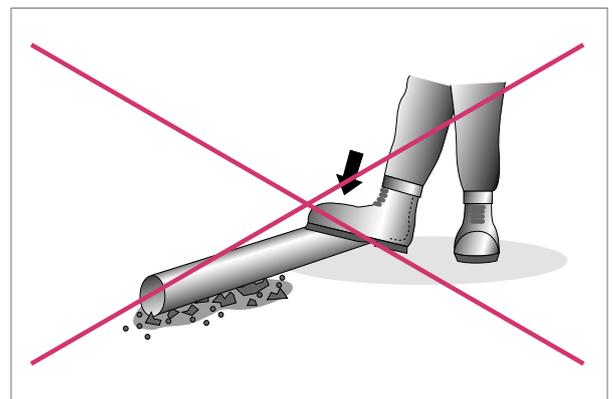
Do not store pipes on sharp-edged surfaces
